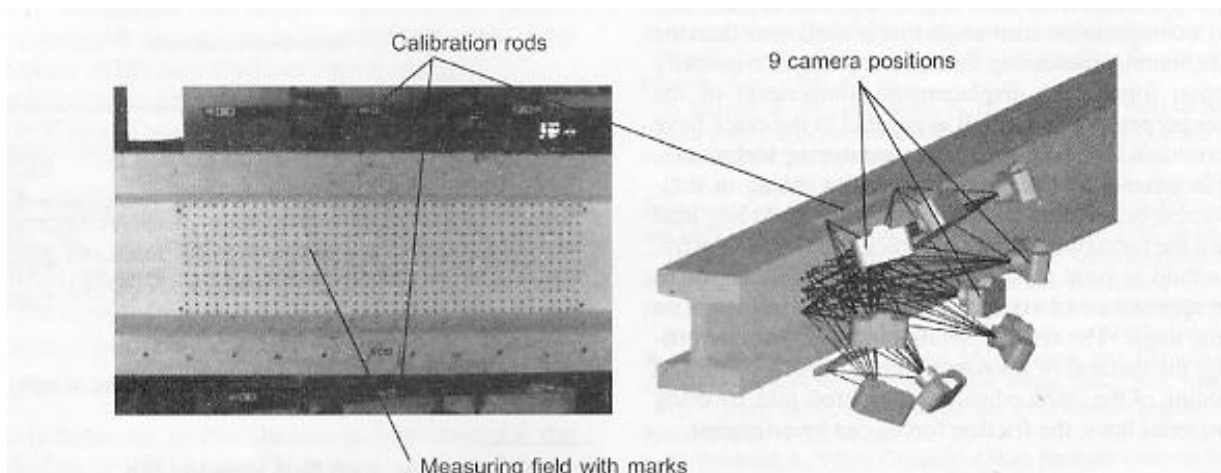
Method of photogrammetry for the study of the crack opening process of prestressed concrete beams (Hegger, 2004)
